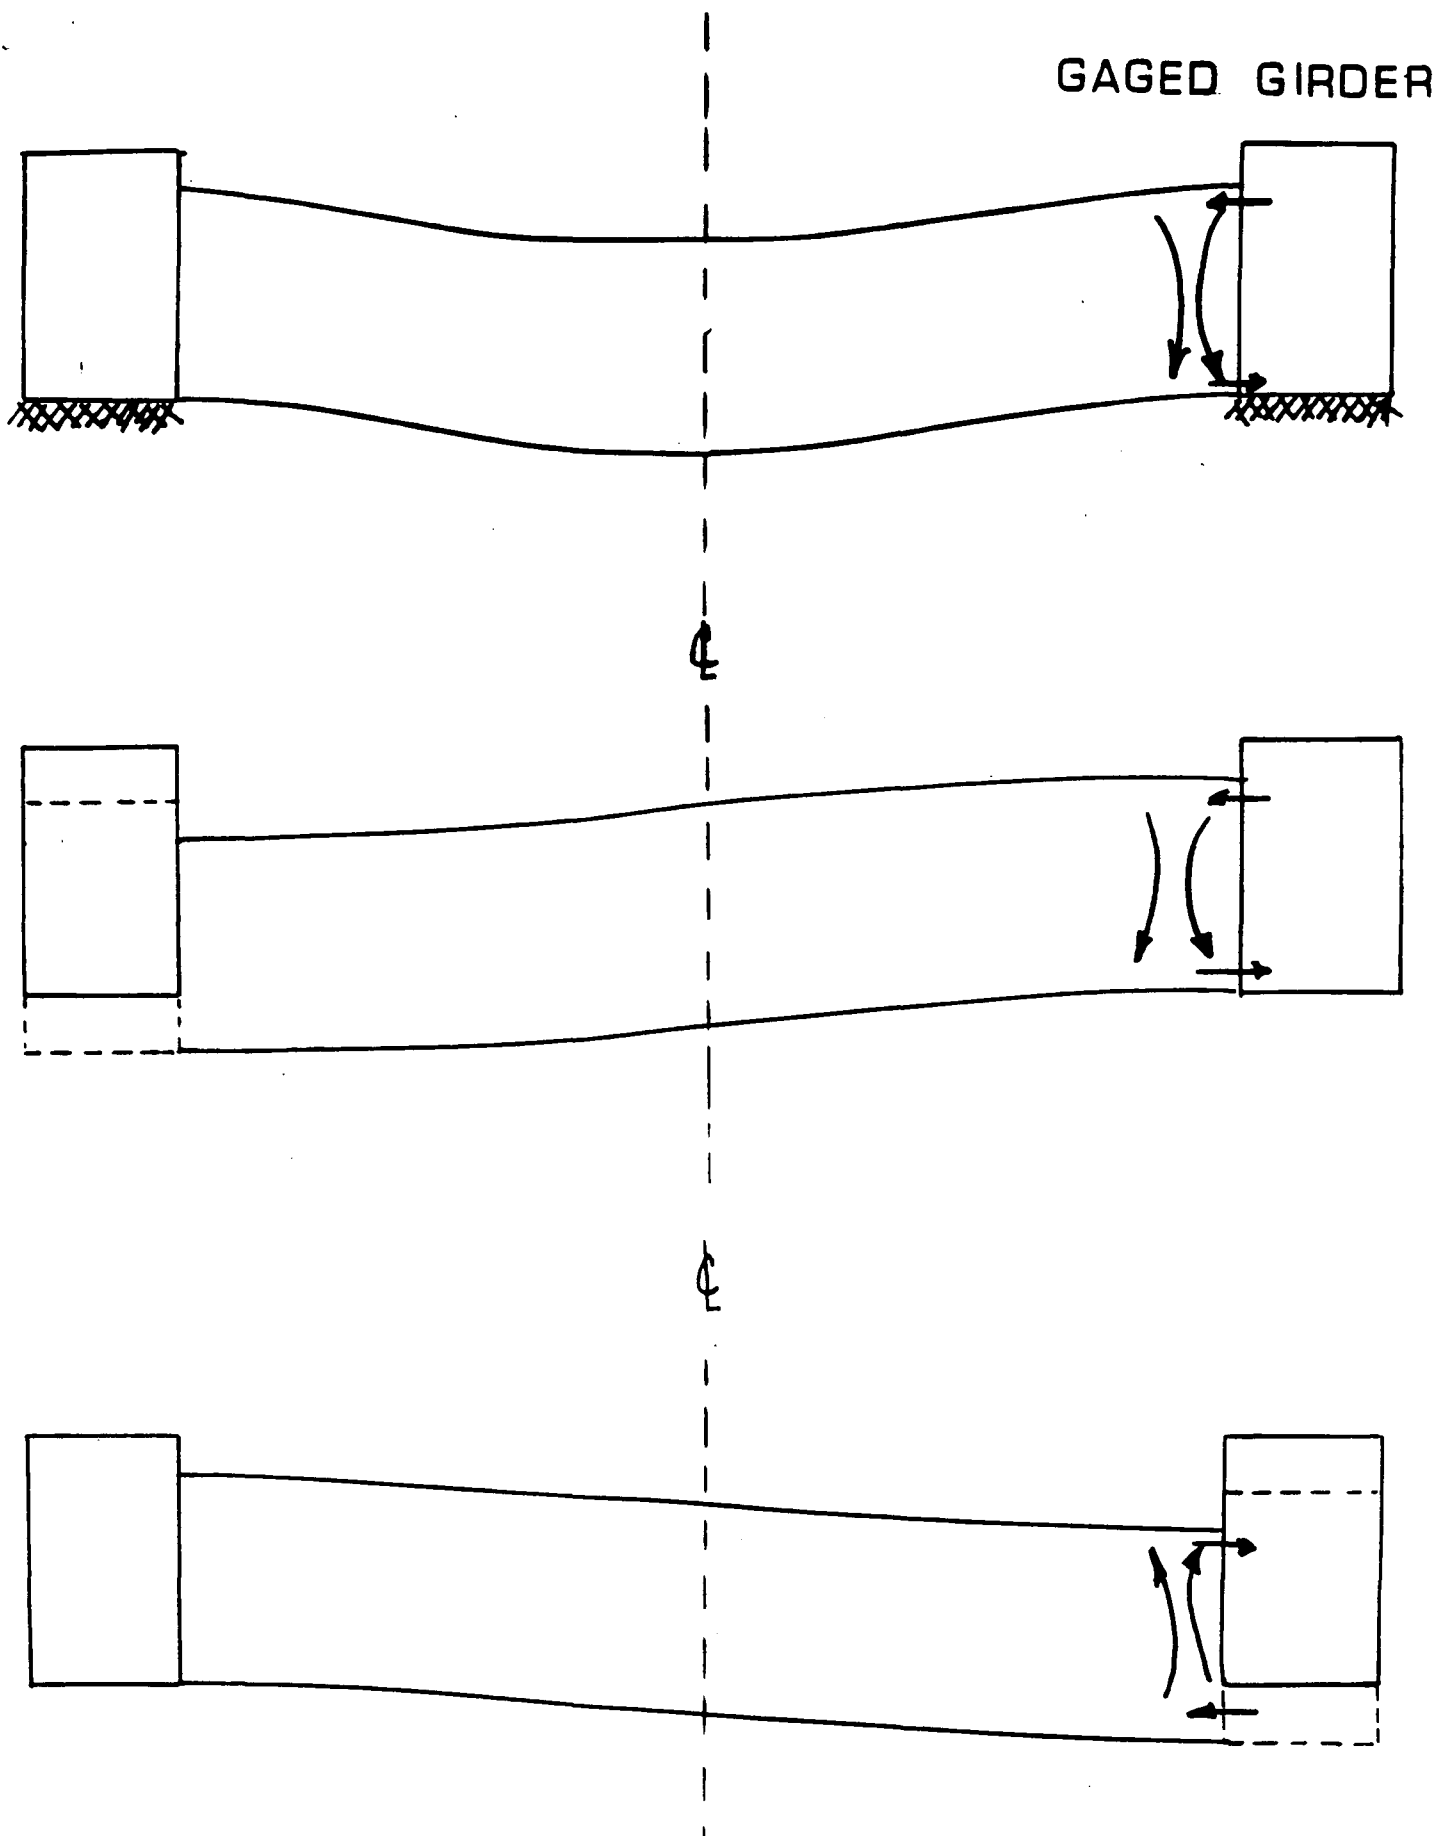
Schematic Showing Possible Deformed Shapes of Floor Beam and Tie Girders
